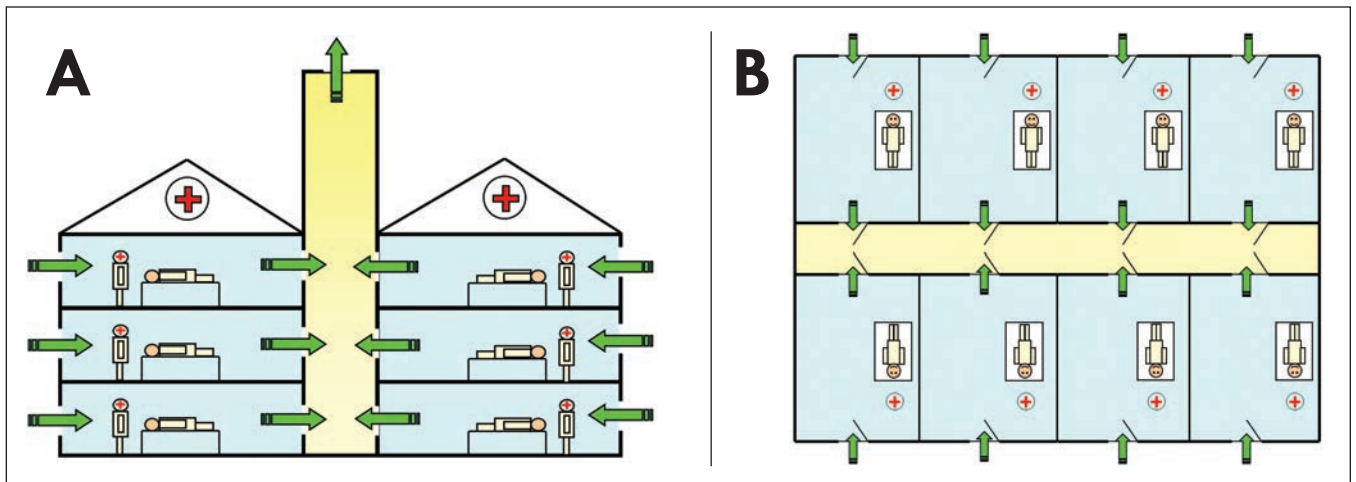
Combined wind- and buoyancy-driven (including solar chimney) natural ventilation in the (solar-assisted) chimney type of hospital. A) Section plan; B) floor plan.²
